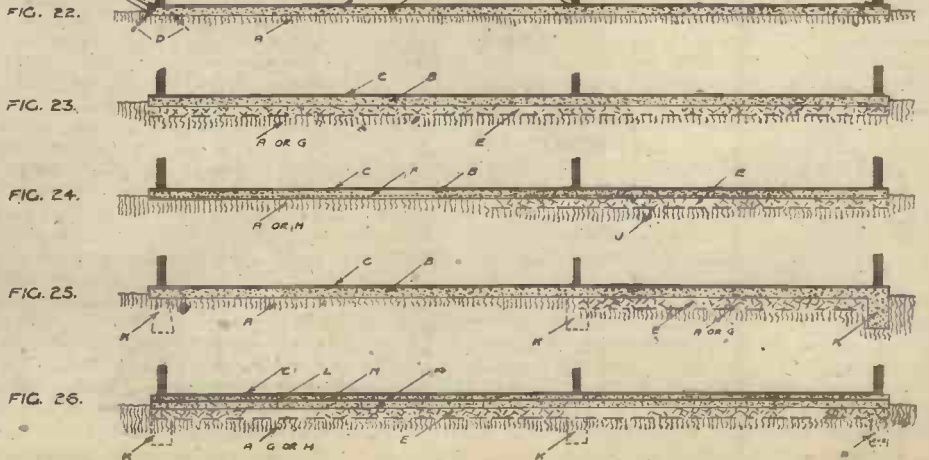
Solid cast-in-situ concrete floor on hardcore.
